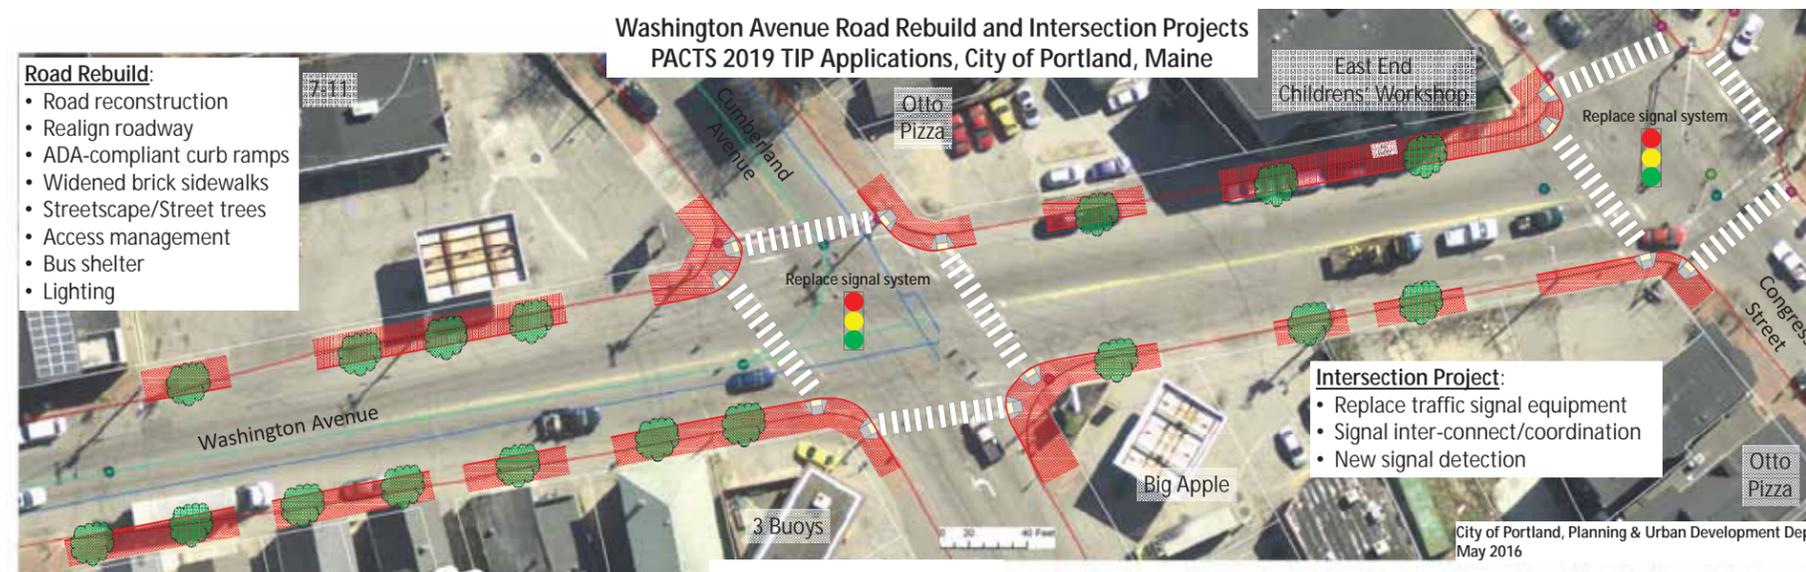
Washington Avenue/Cumberland Street Intersection. Source: Planning and Urban Development
